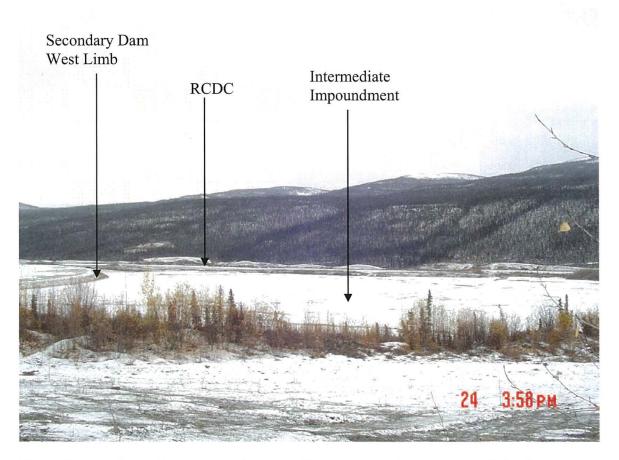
Secondary Dam, Intermediate Impoundment, and RCDC as seen from north slope.
